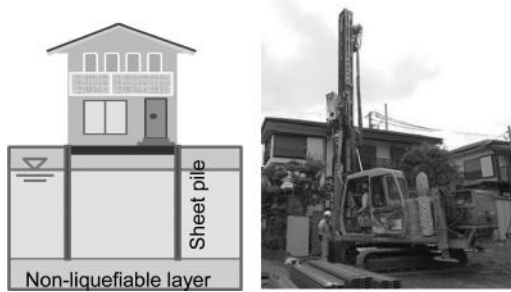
Enclosing foundation soil with sheet pile wall for constructing new houses or for existing houses.
